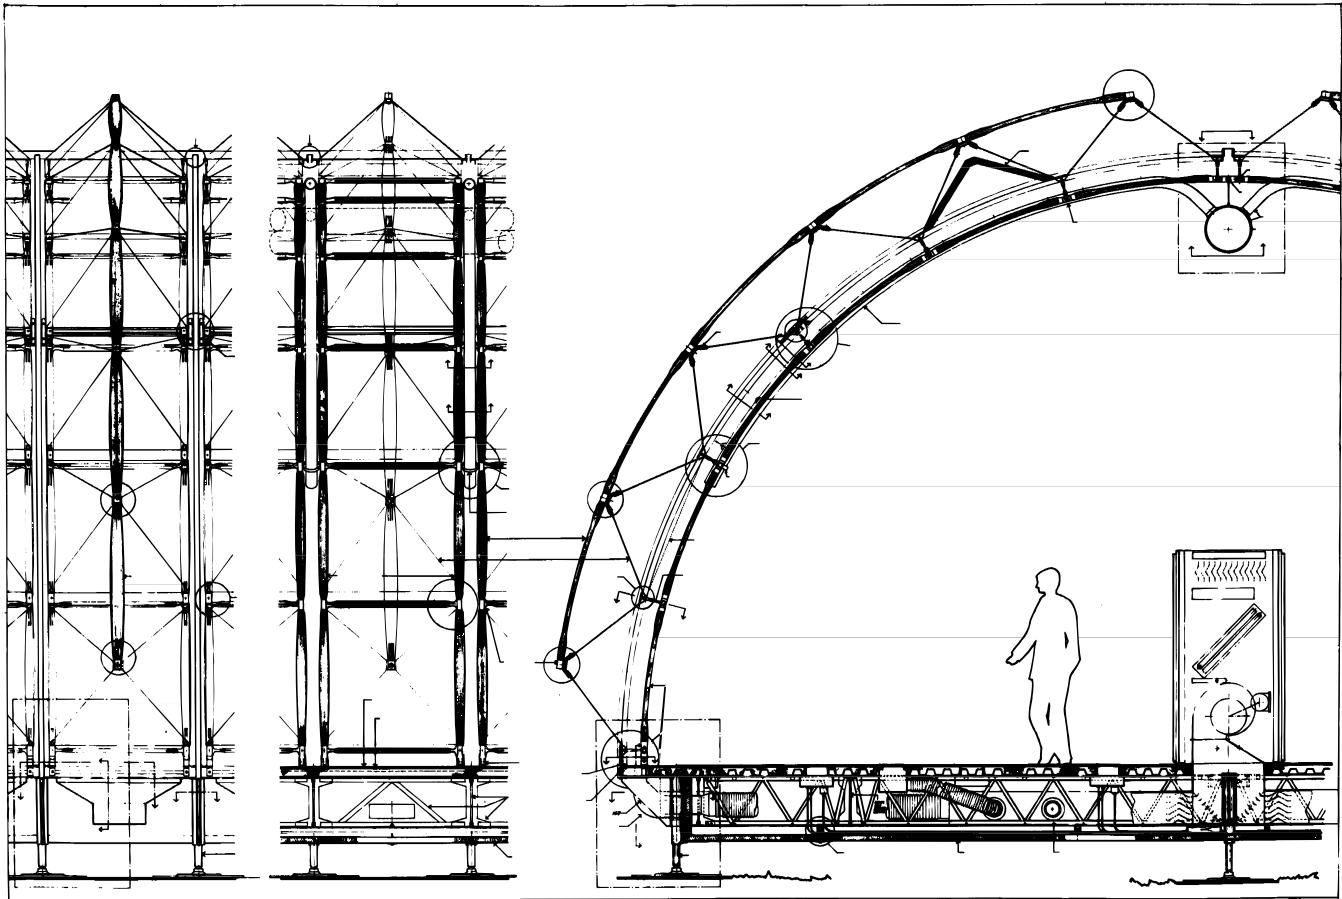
Detailed cross-section and part elevation, IBM pavilion. The sub-floor area contains services including ducts to the central air-conditioning unit.
